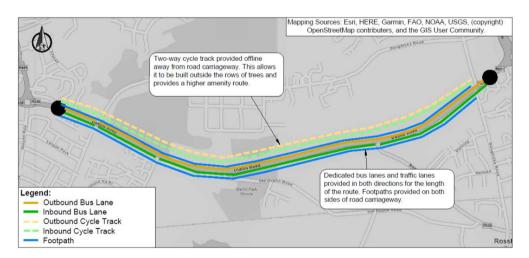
Section 2 Option 4 Indicative Scheme Design
